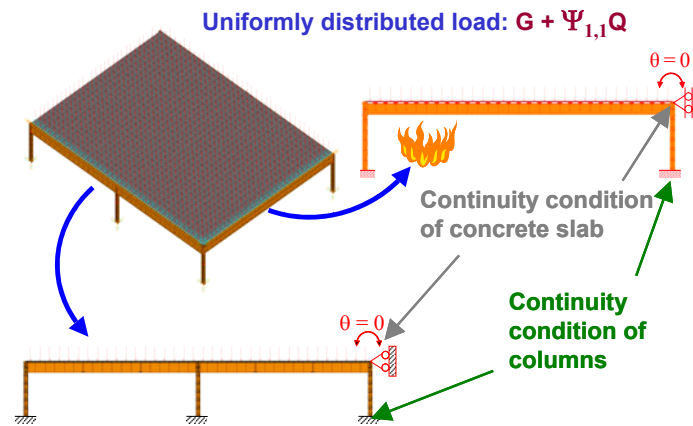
Application of mechanical loading as well as boundary condition to modelled part of the structure
